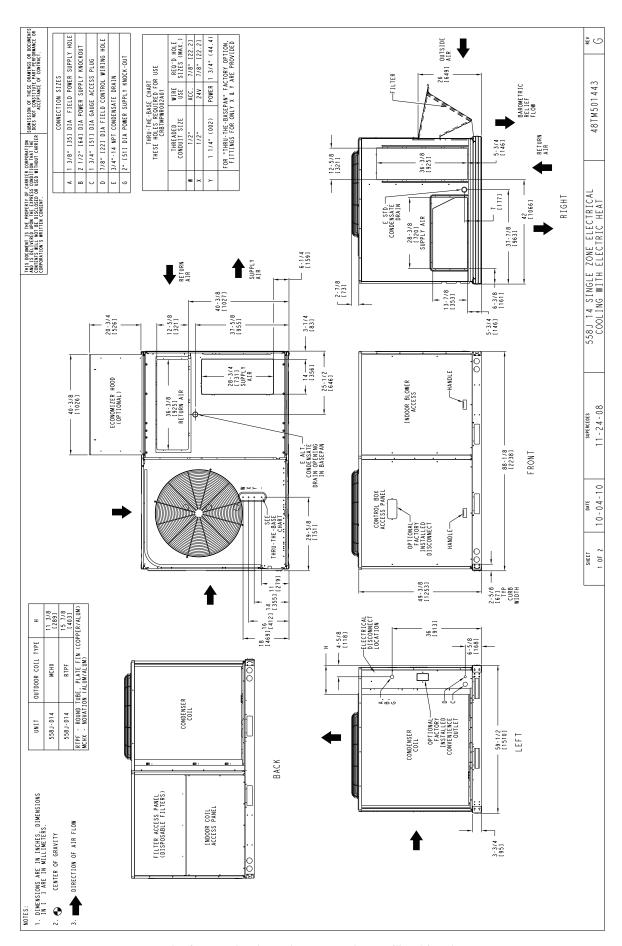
Unit Dimensional Drawing — Size 14 Unit
